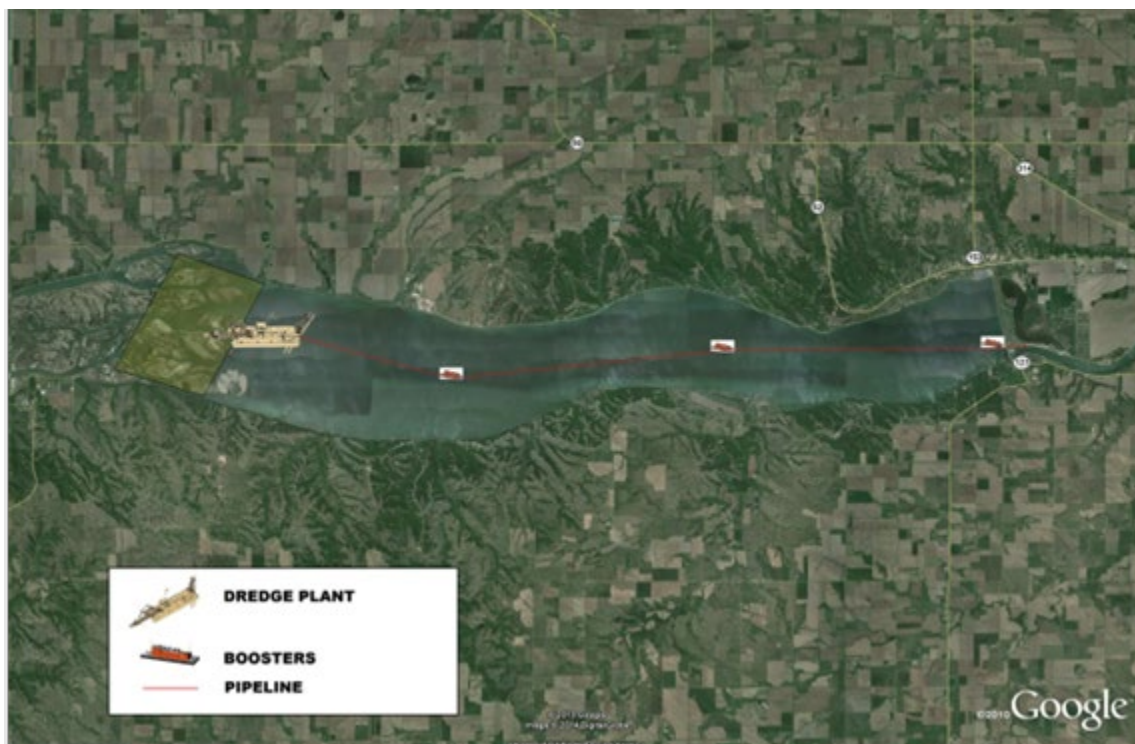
Continuous Pipeline Dredge Plant Layout
